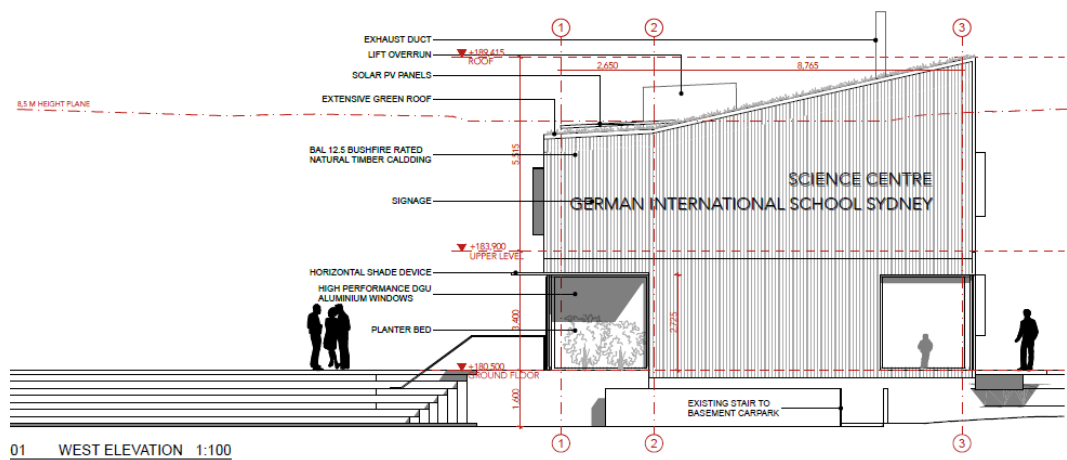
West elevation of proposed science building (Source: Betti&knut architecture)
